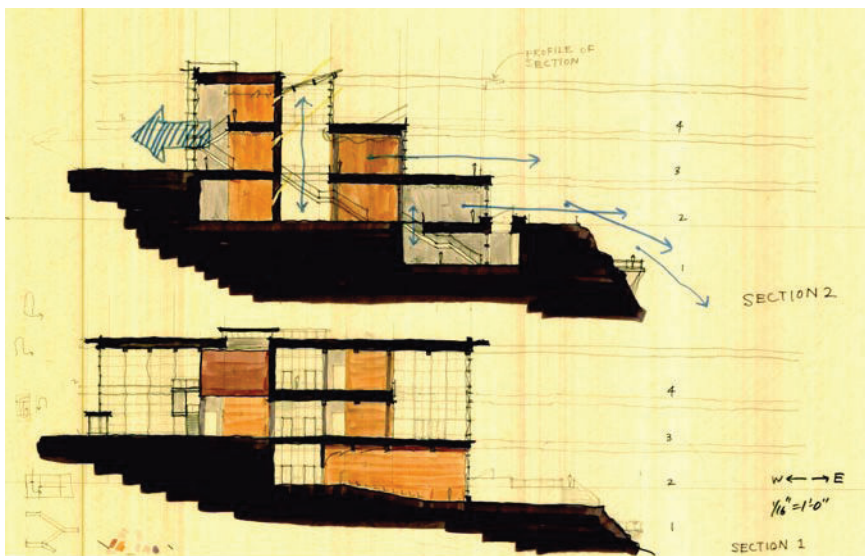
Section view speculative Design 2. [Drawing by Emily Childs]
